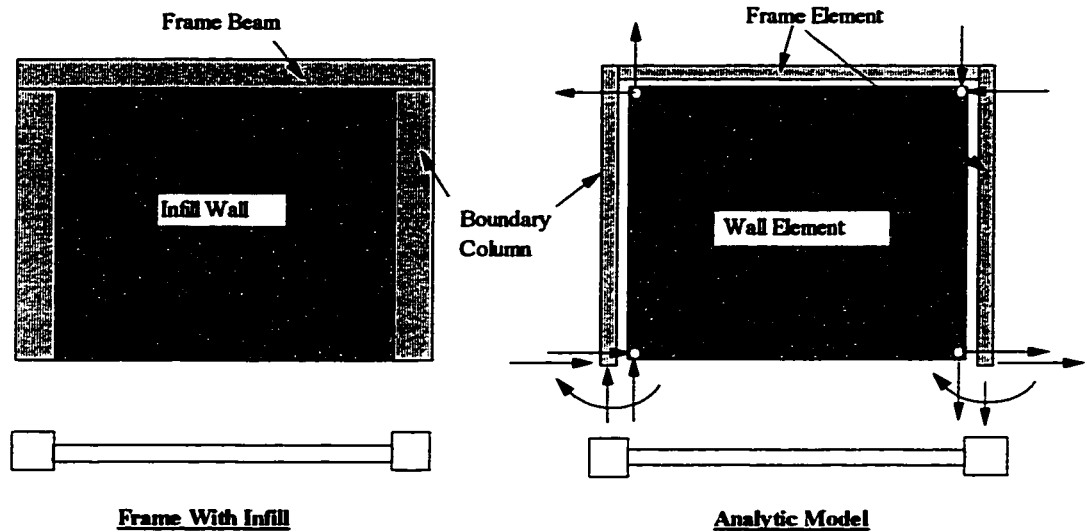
DRAIN-2D Analytic Model for Infill Wall
